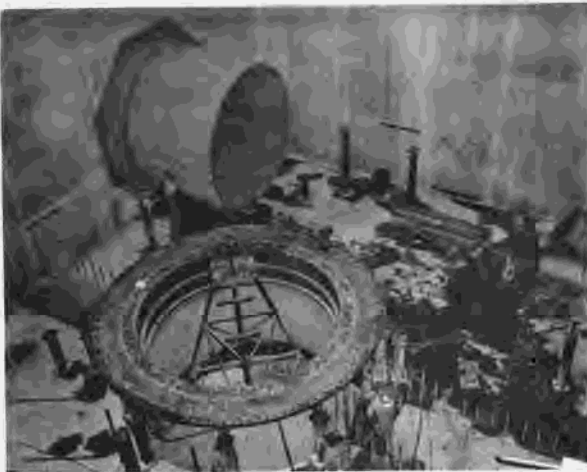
Preparations underway for installation of distributor ring in unit bay 1 of powerplant. P557-420-8075, March 7, 1963.
